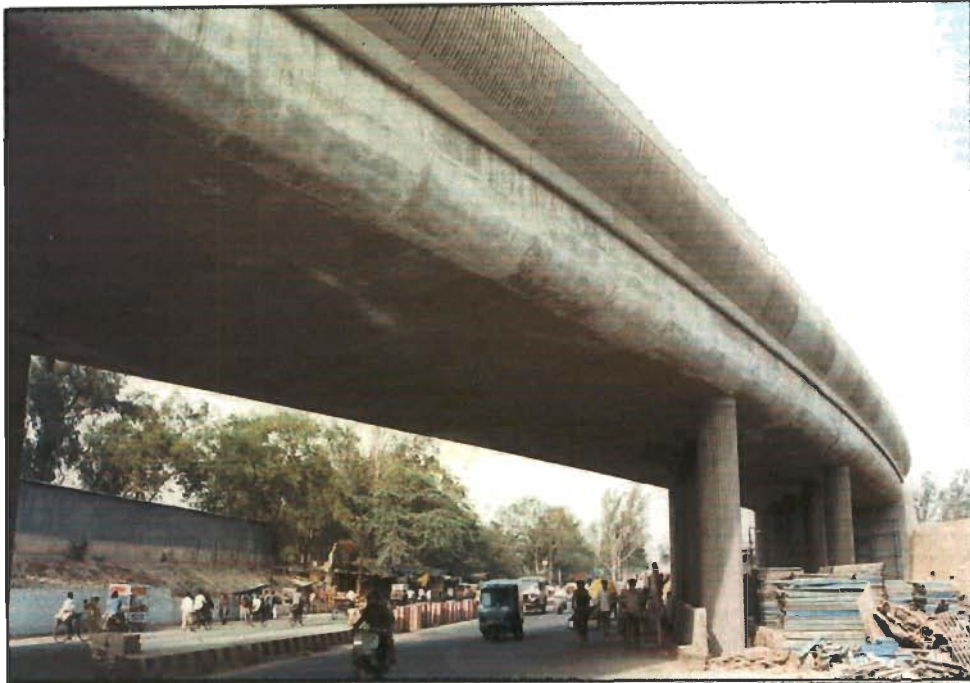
Integral abutment bridge flyover for Delhi Metro with 70° skew
